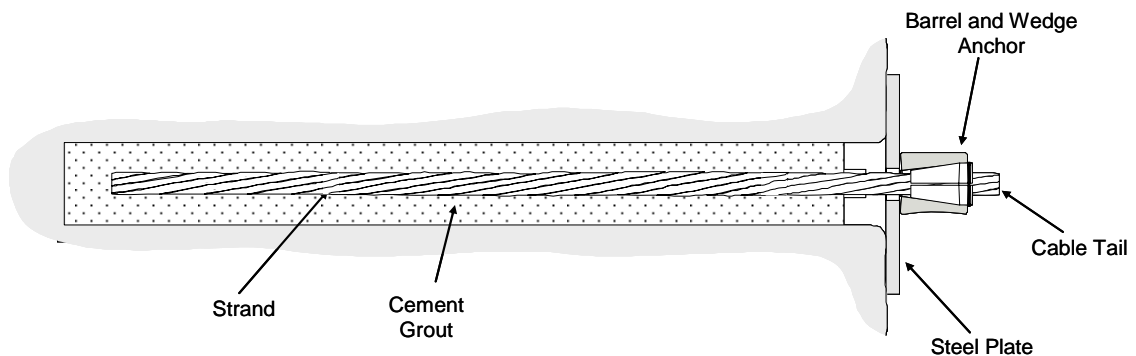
A basic cable bolt assembly (Thompson 2004b).
